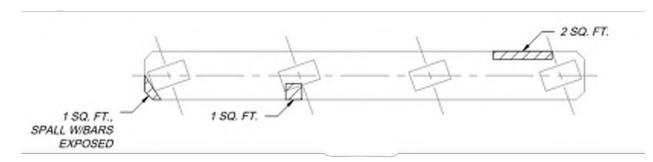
Location of Proposed Concrete Repairs - Pier 2 Downstation (North) Face Elevation MP 182.1
